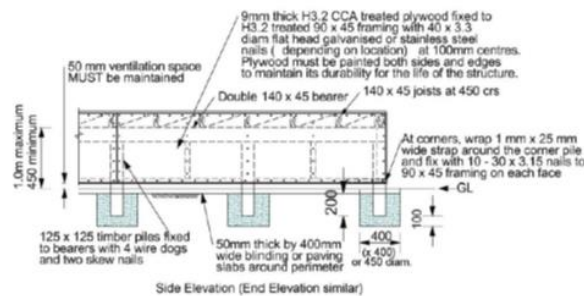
Detail of Type 2A surface structure at the timber piles (including gravel raft)
